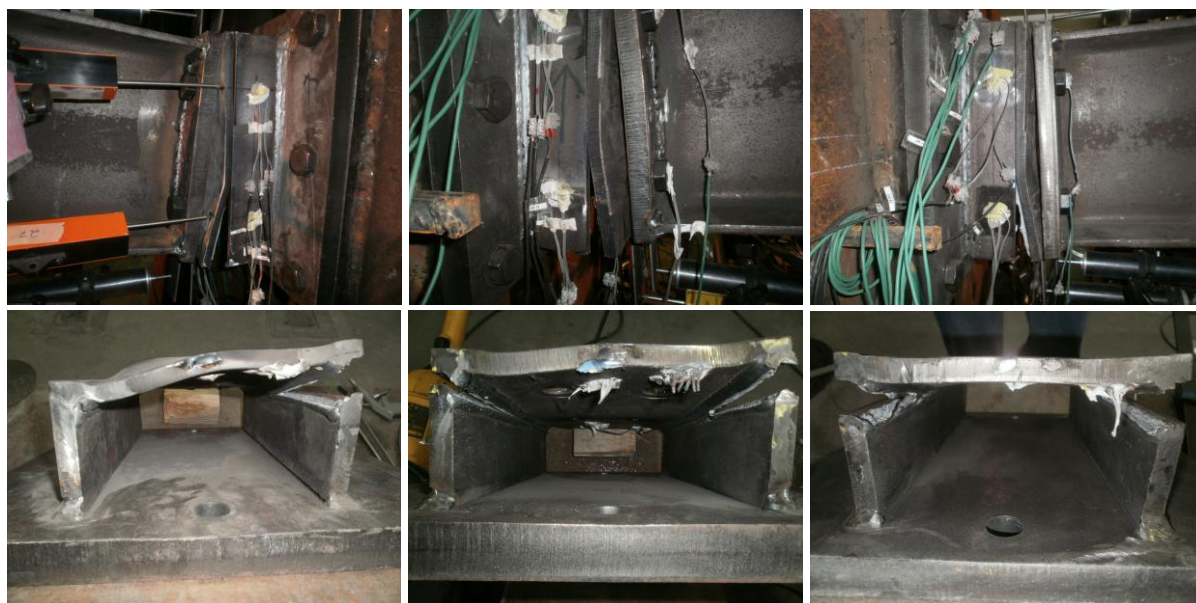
Fillet weld failure for channels A-11 (left), A-14 (middle) and A-16 (right)
